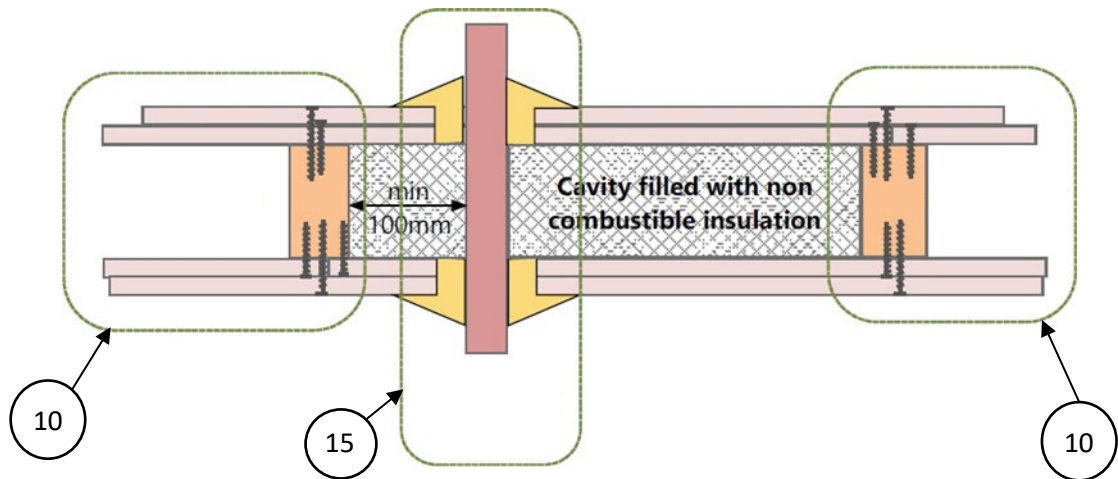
Insulated cavity service penetration through timber-framed construction – Plan view
